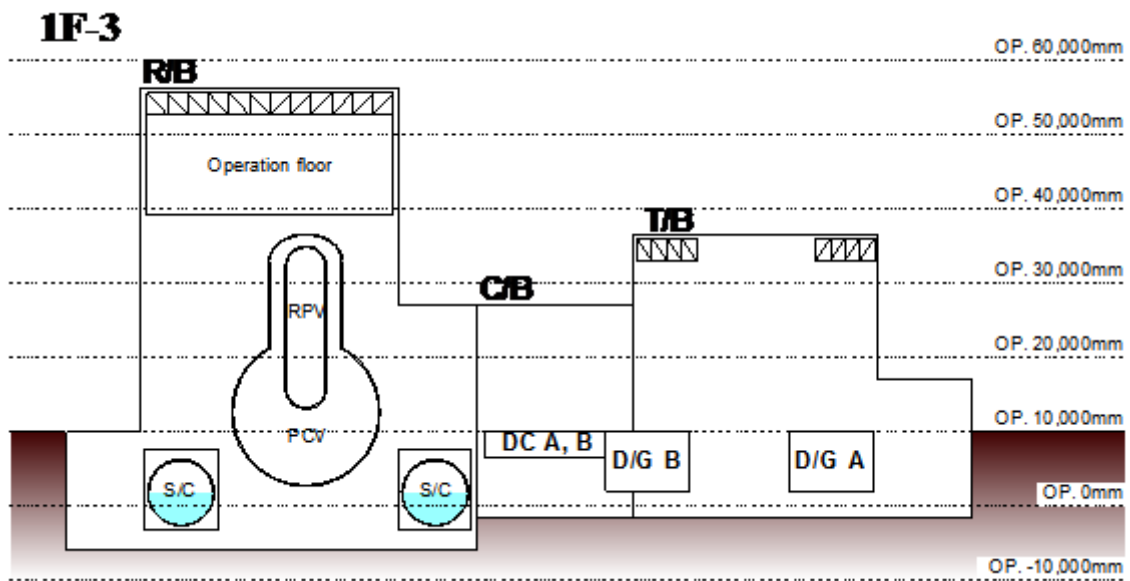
Building Cross-section for Unit 3, Fukushima Dai-ichi NPS
